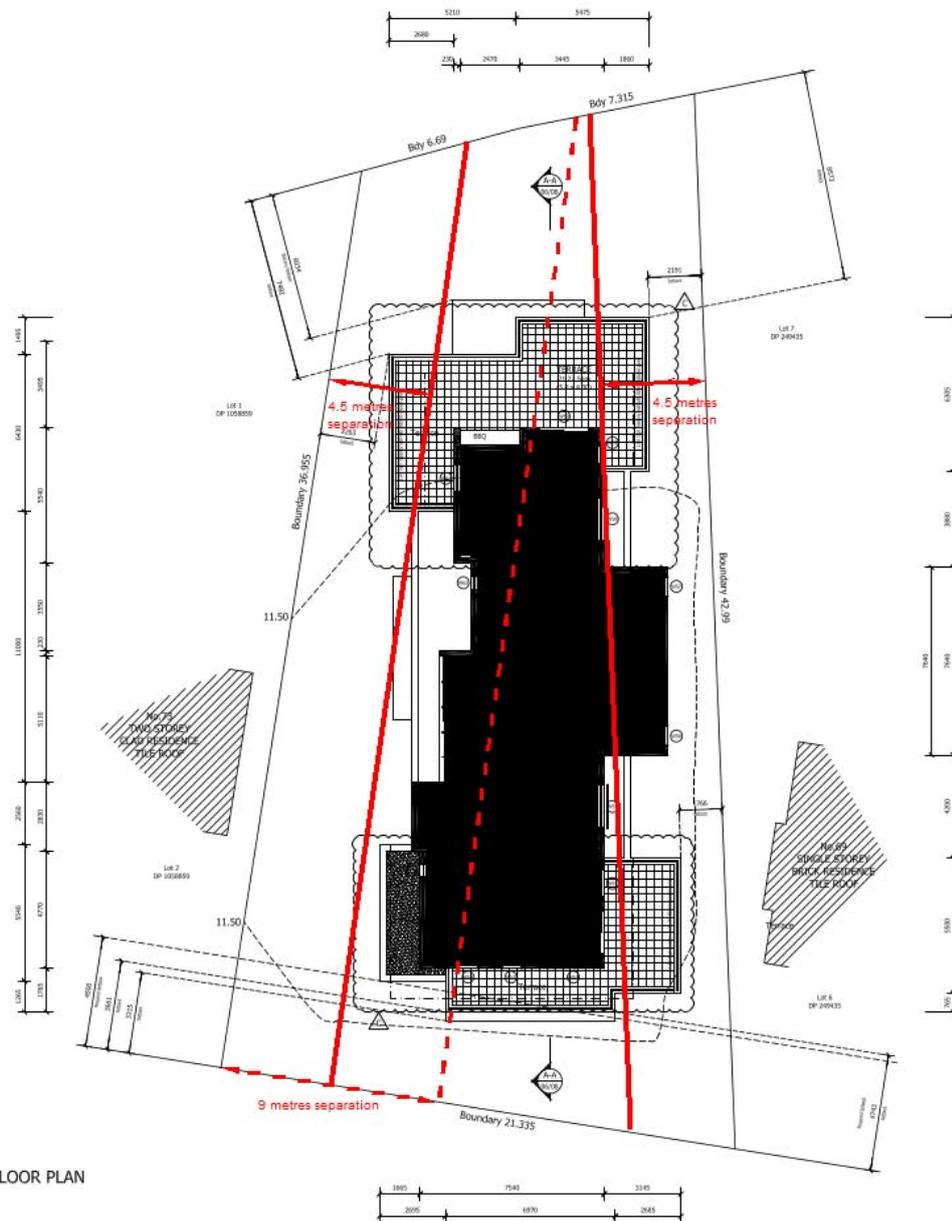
Extract of the floor plan that shows the extent of non-compliance with Building Setbacks on levels 5
